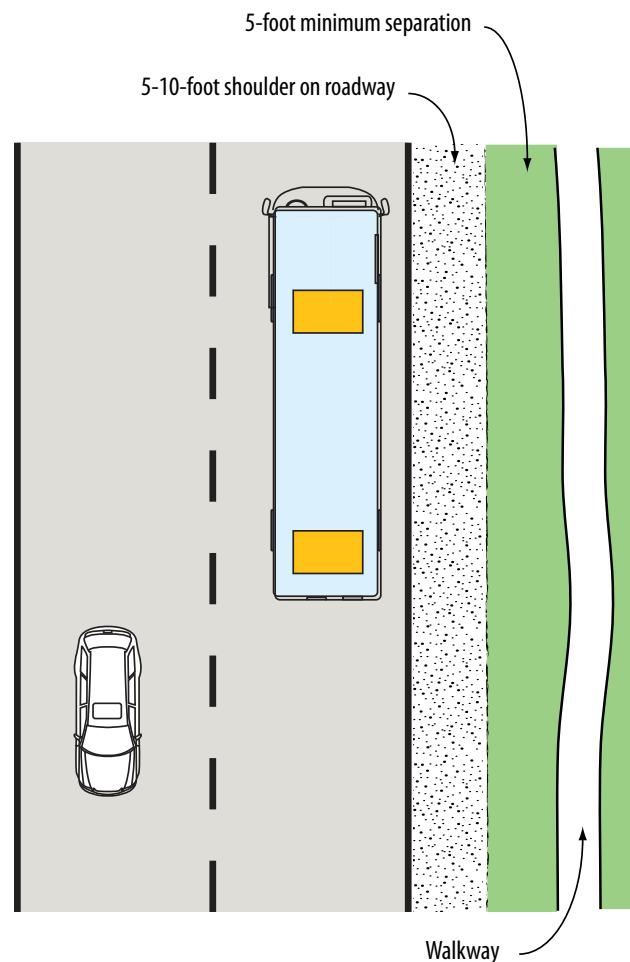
Walkways may be needed alongside rural roads where full sidewalks are not yet feasible.
